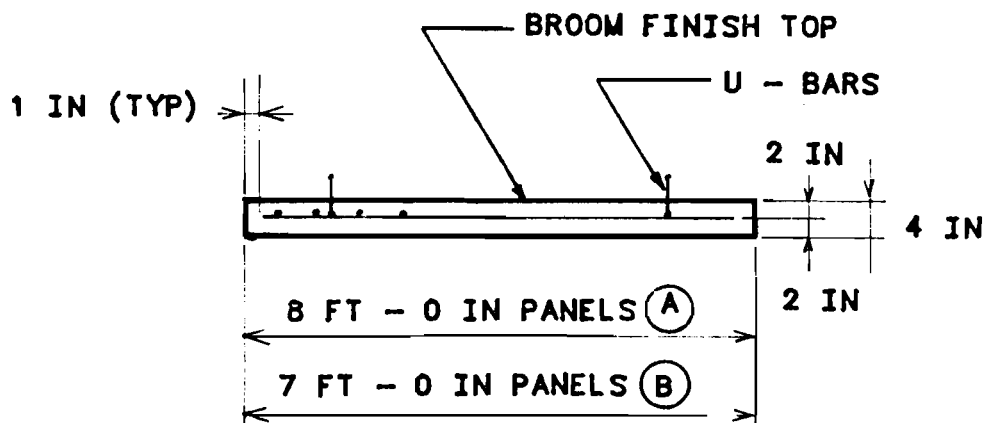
Cross section of laboratory specimen showing precast, prestressed panels
